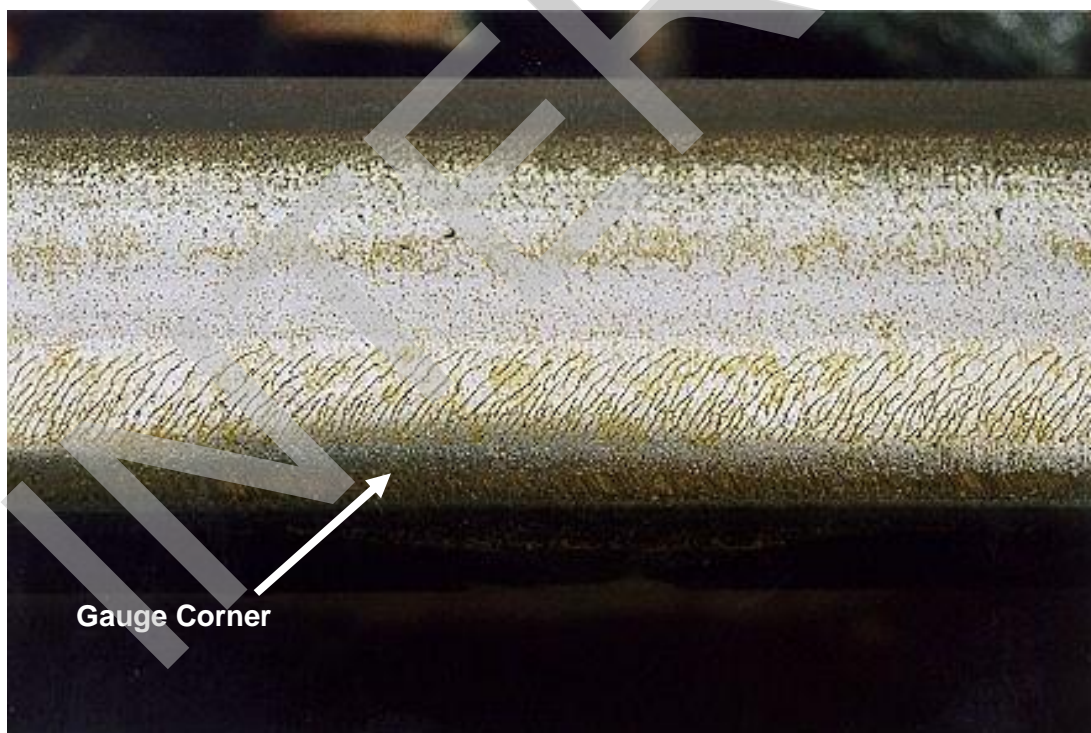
(a) Initial stage of development of gauge corner checking cracks
